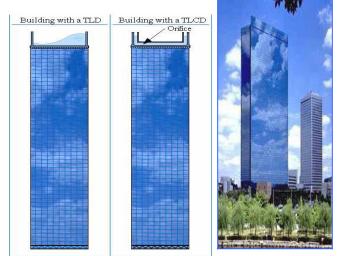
Building with a TLD and a TLCD (Application in the Crystal Tower Building of Chicago)
